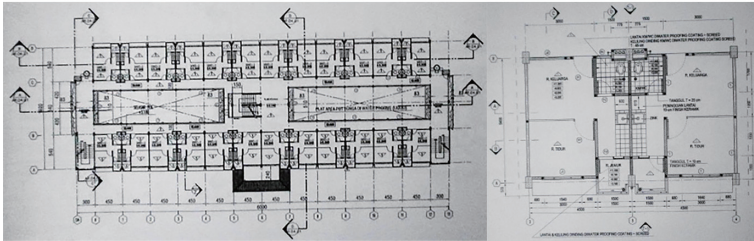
Floorplan of a Typical Rusunawa. Source: Author
